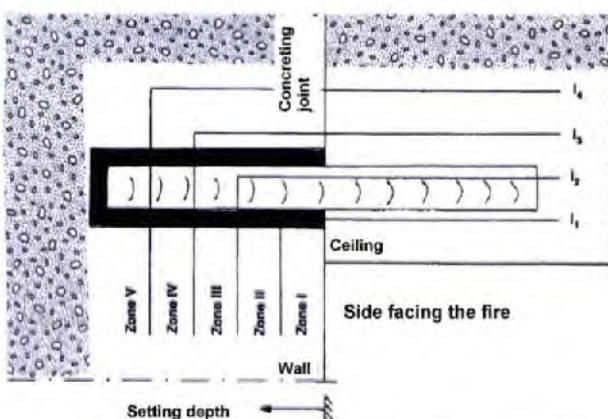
Schematic diagram of the reinforcement connection variant "anchorage"
